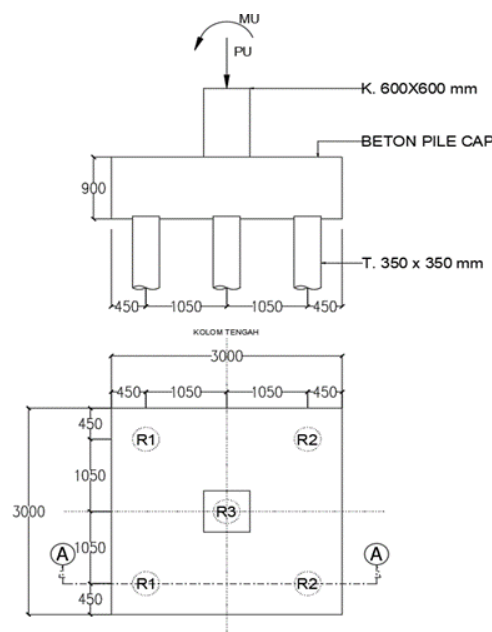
Geometry and reinforcement arrangement of the five-pile pile cap designed using the Conventional Method.
